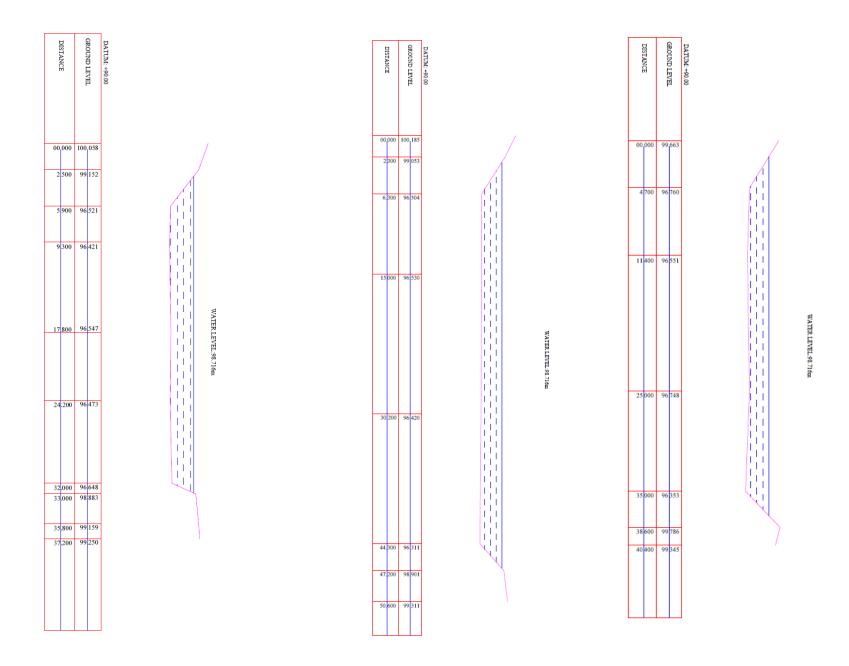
A. Cross Section B. Cross Section C. Cross Section
